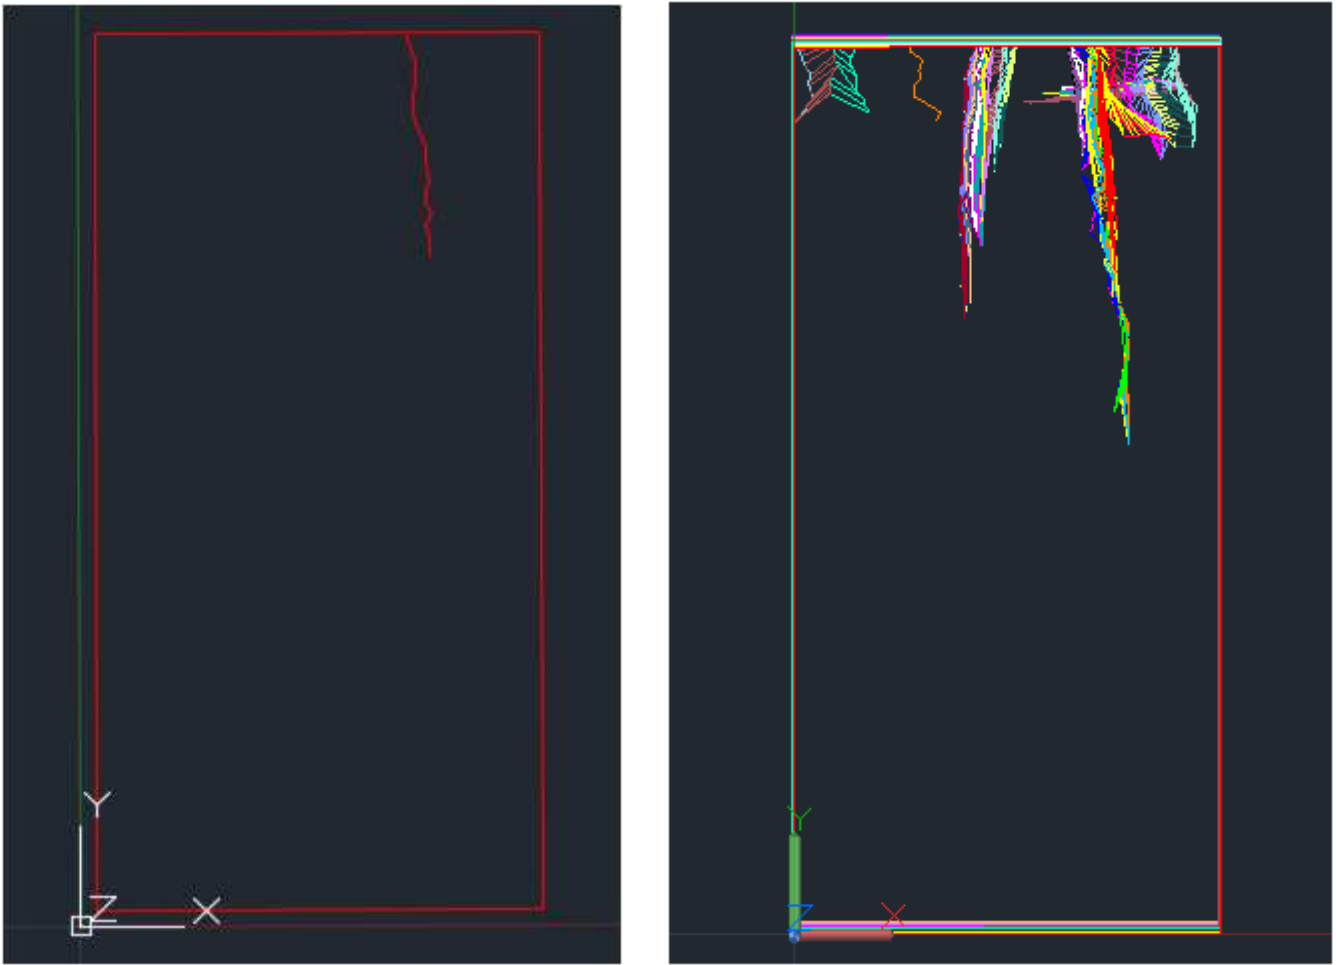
Digitizing the vertical cracks form front view of drilled core.
